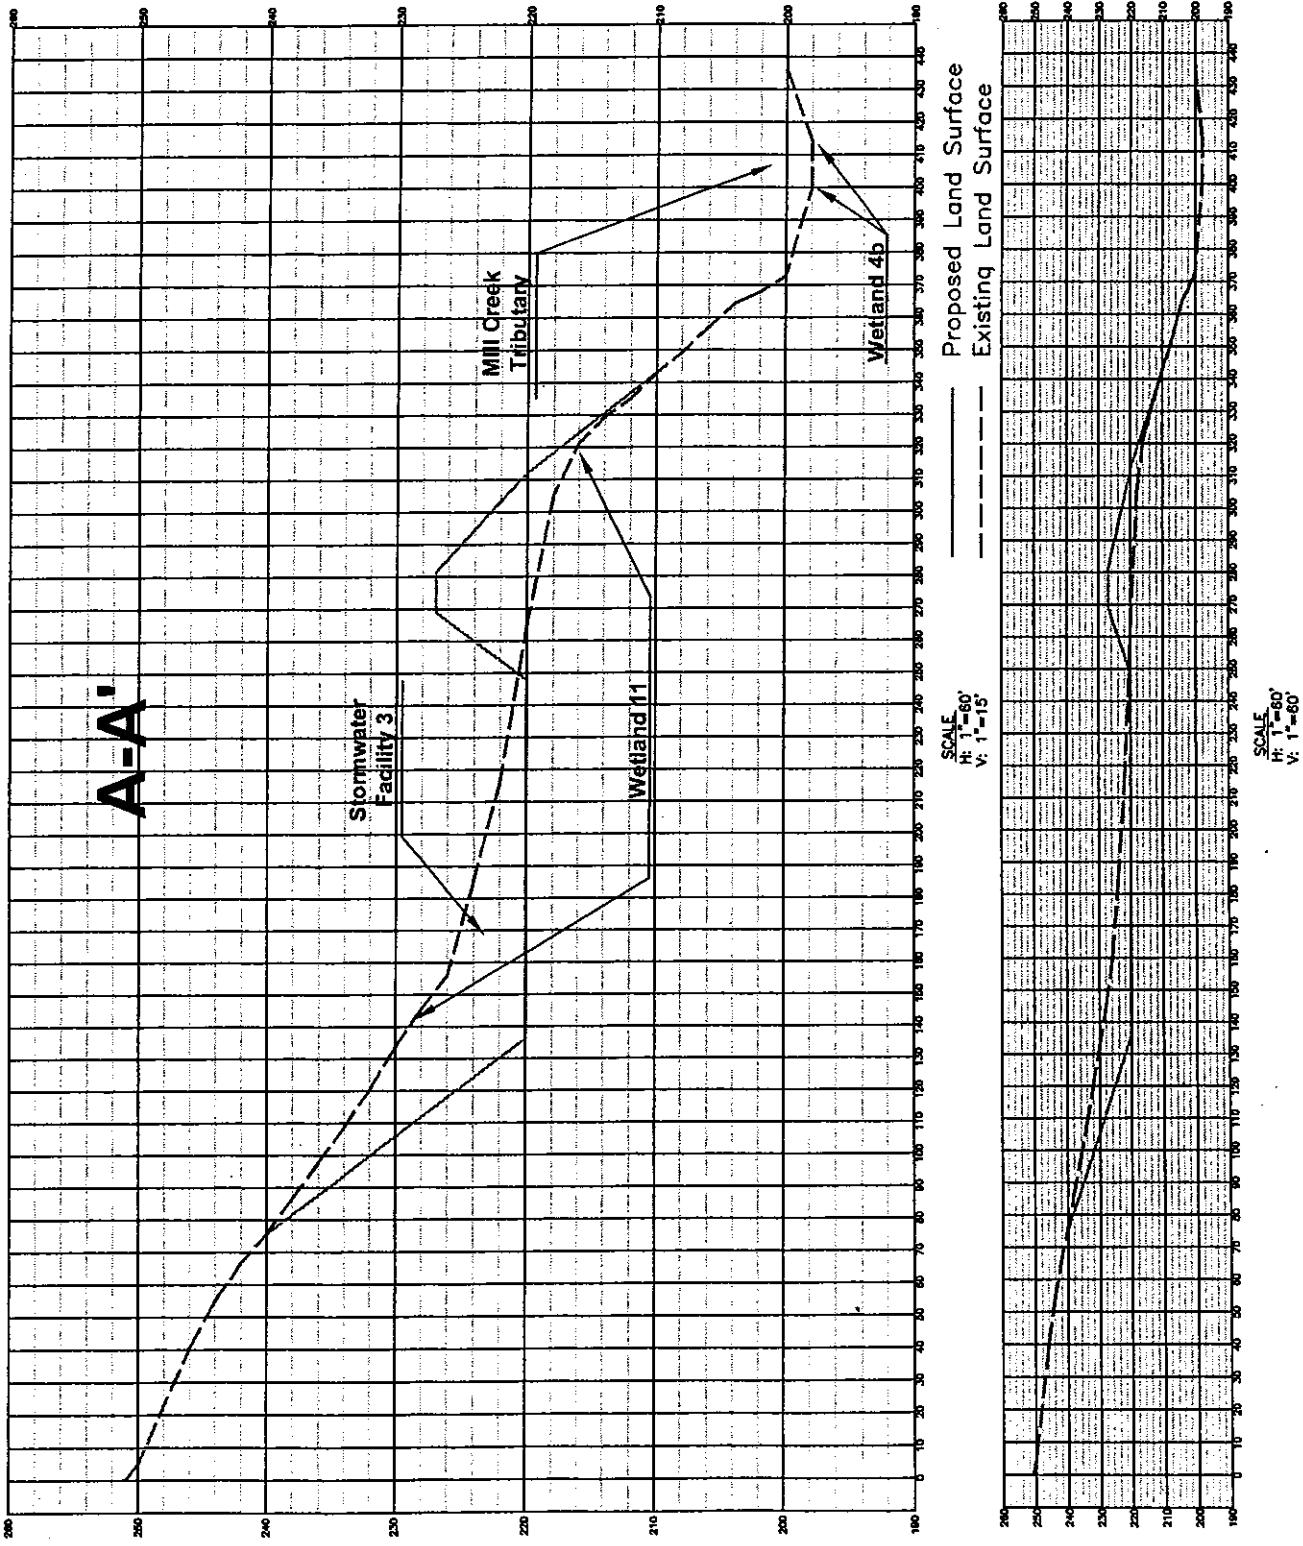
NE 179th St. Stormwater Facility 3 Section A-A'
